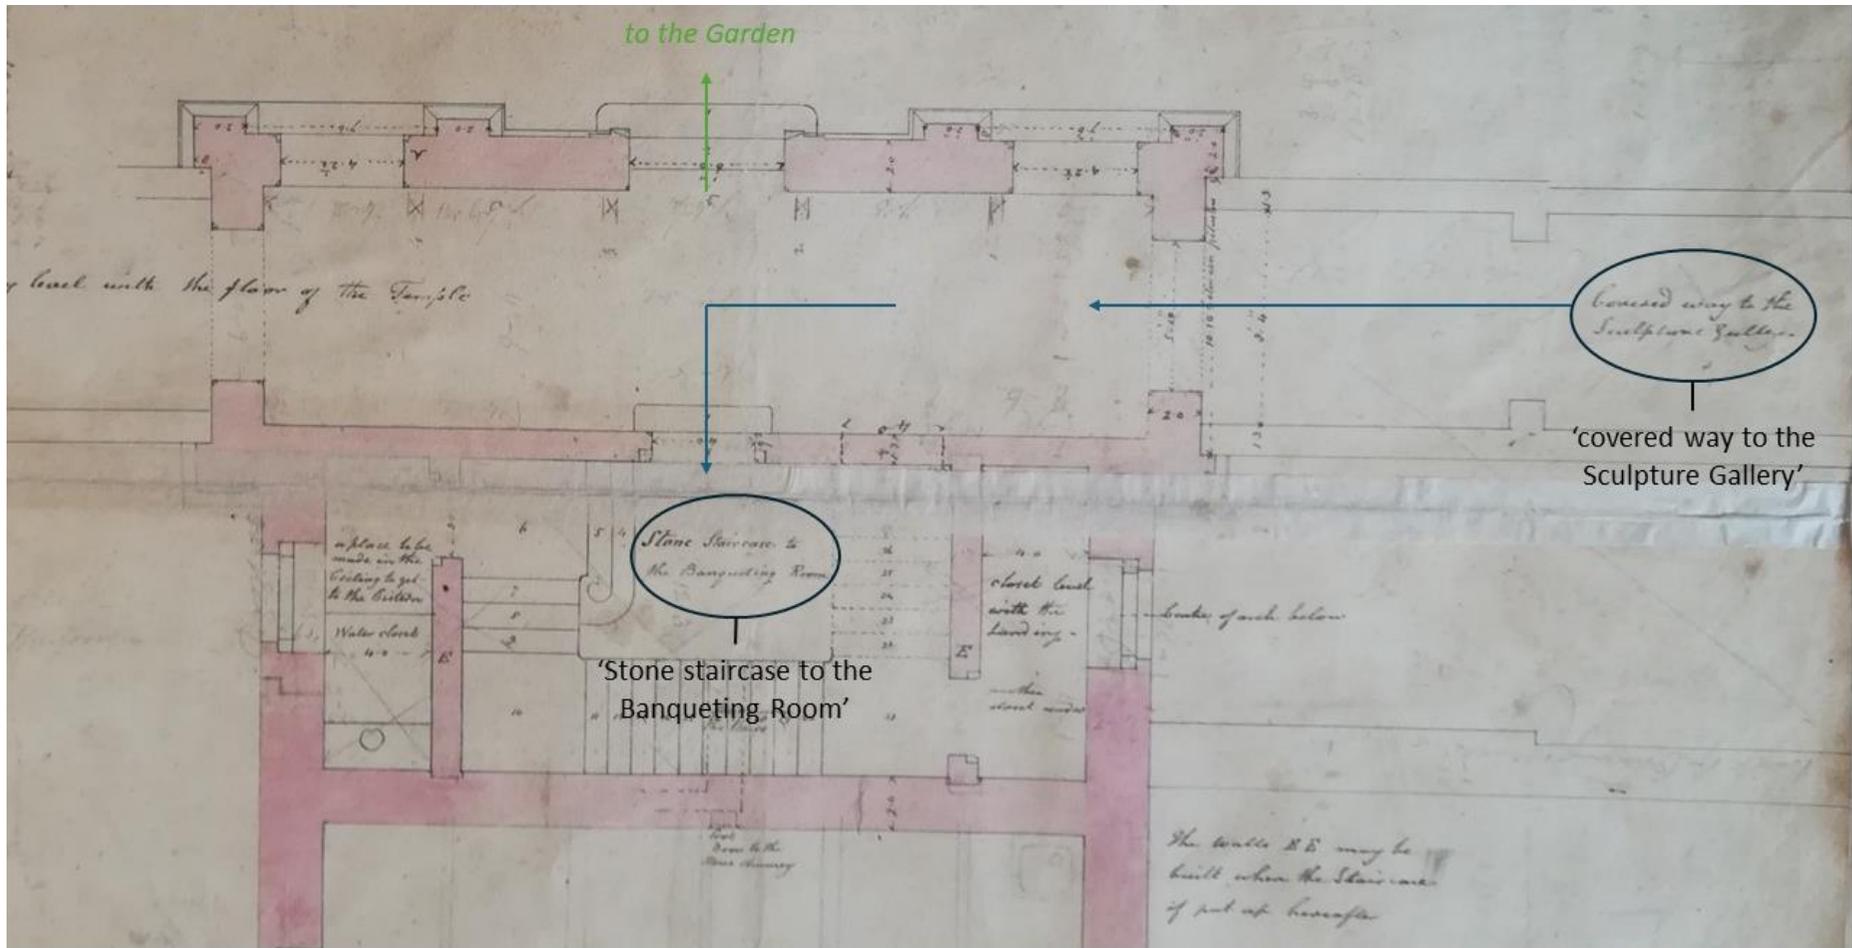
Architectural drawing showing the floor plan of the lobby and staircase to the Banqueting Room building at the 'Principal' level. The covered way connects to the lobby of the building from the right; arrows illustrate the route to the dedicated staircase; access to and from the Garden is at the top of the image (WY/N/ii/5).
